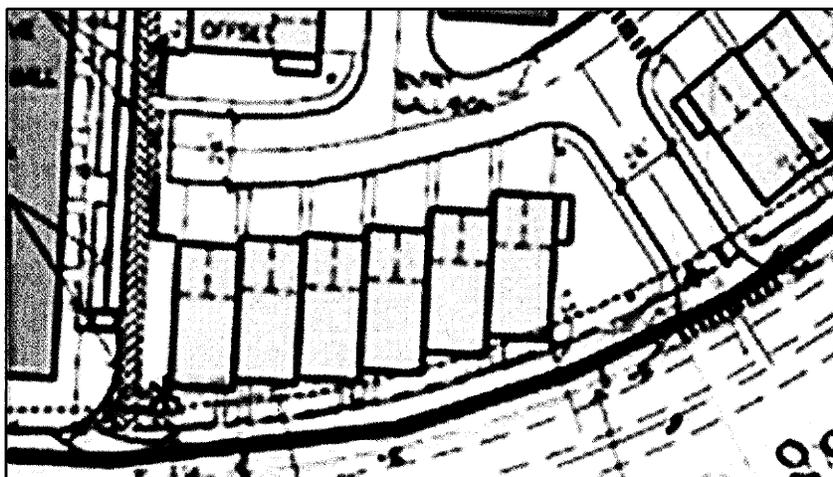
Detail of Garages- CDP/FDP Plan Page 6
